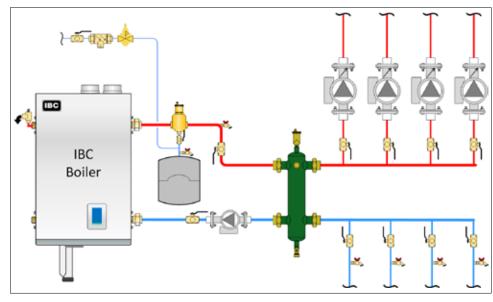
Basic Primary-Secondary piping with hydraulic separator concept
